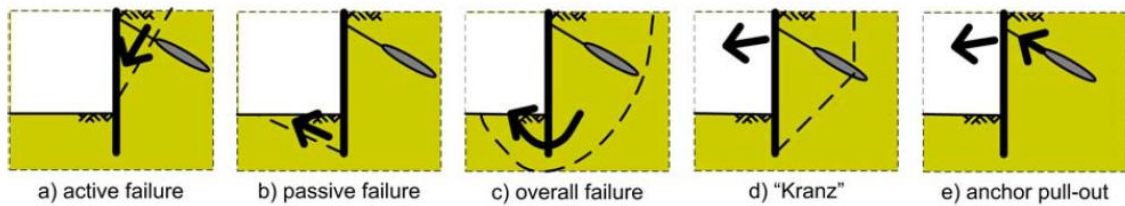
Failure mechanism in the soil for anchored retaining walls [4]
